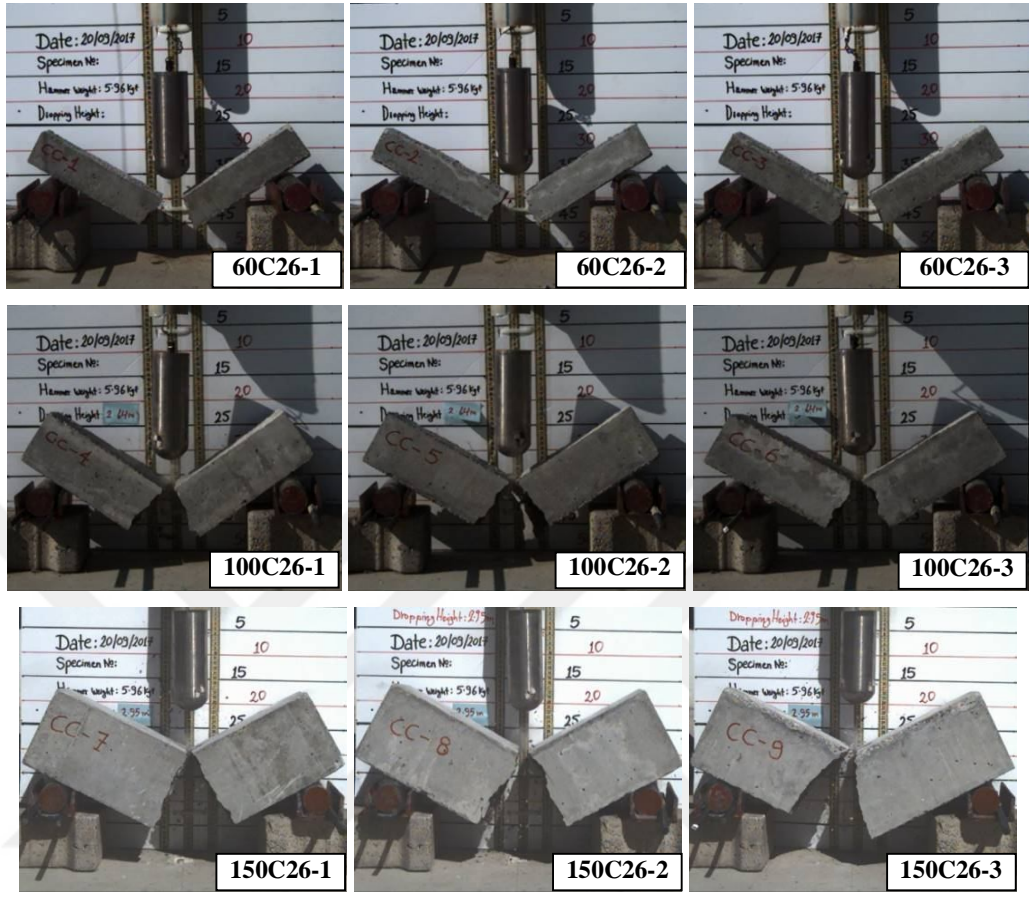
Failure modes of Batch 2 NSC unreinforced specimens (Groups 2, 4, and 6)
